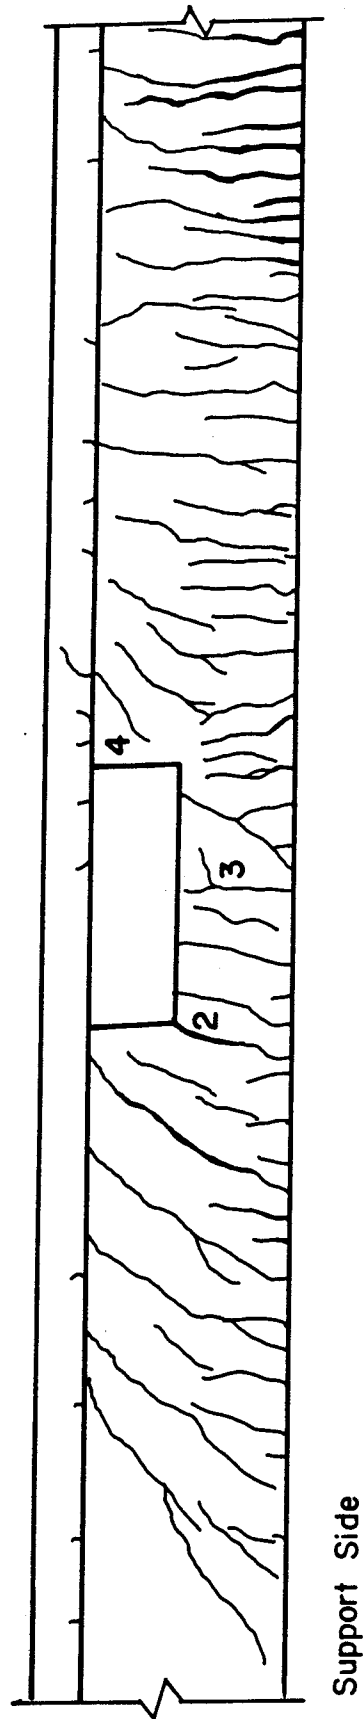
Crack Pattern - BEAM D3.
